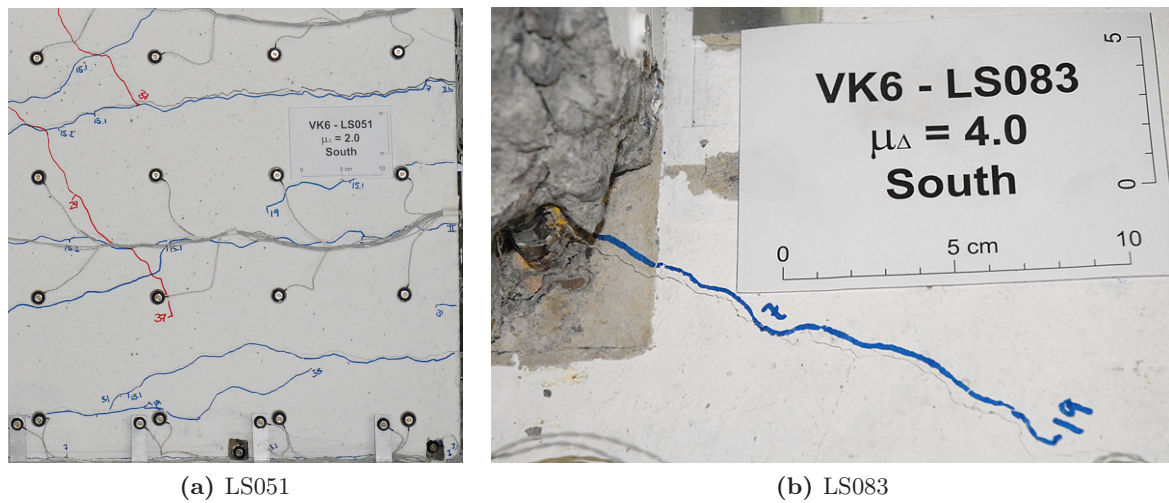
Front face view of the Northern bottom part of the pier at LS051, $\mu_{\Delta} = 2.0$ South 1st (a) and picture of the crack in the foundation at the North-East corner of the pier, taken at LS085, when the cover concrete had spalled off (b).
